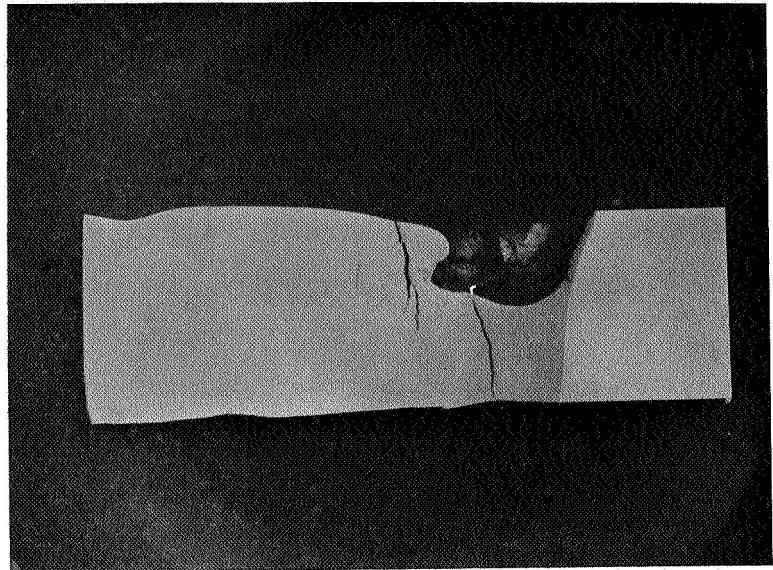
Longitudinal Sections Through Beam Cut-off Points
